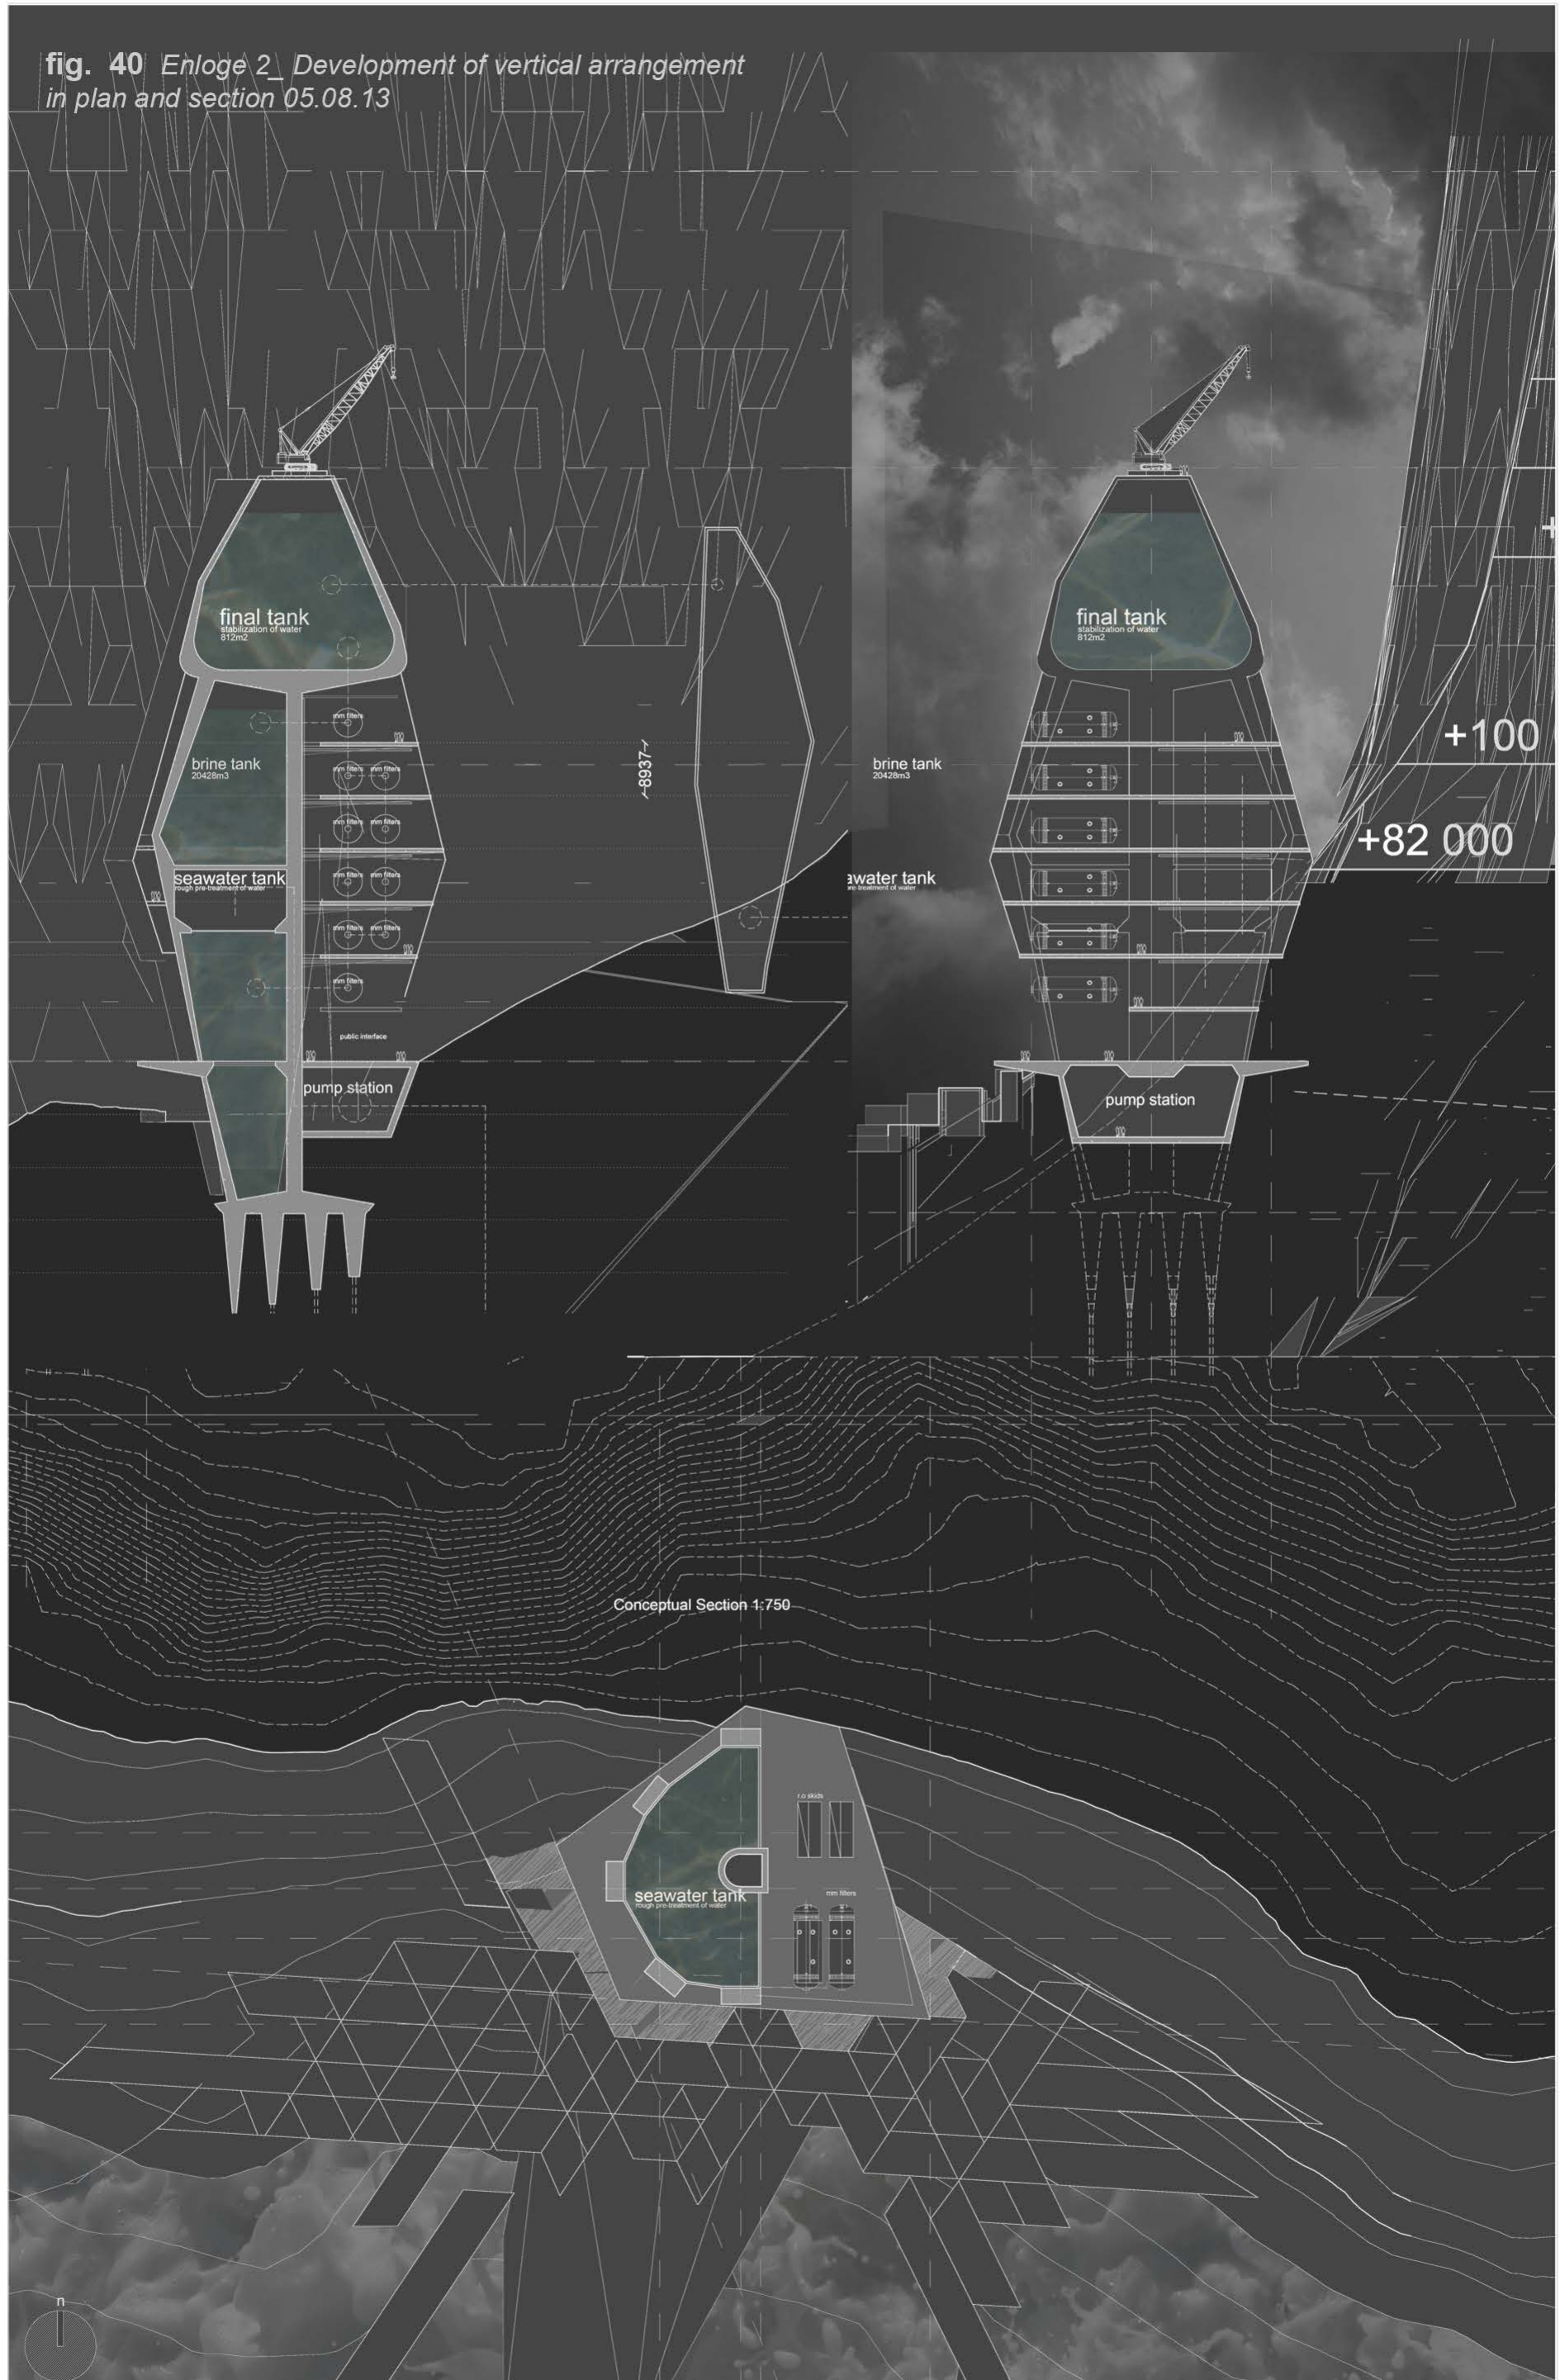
Enloge 2_ Development of vertical arrangement in plan and section 05.08.13
